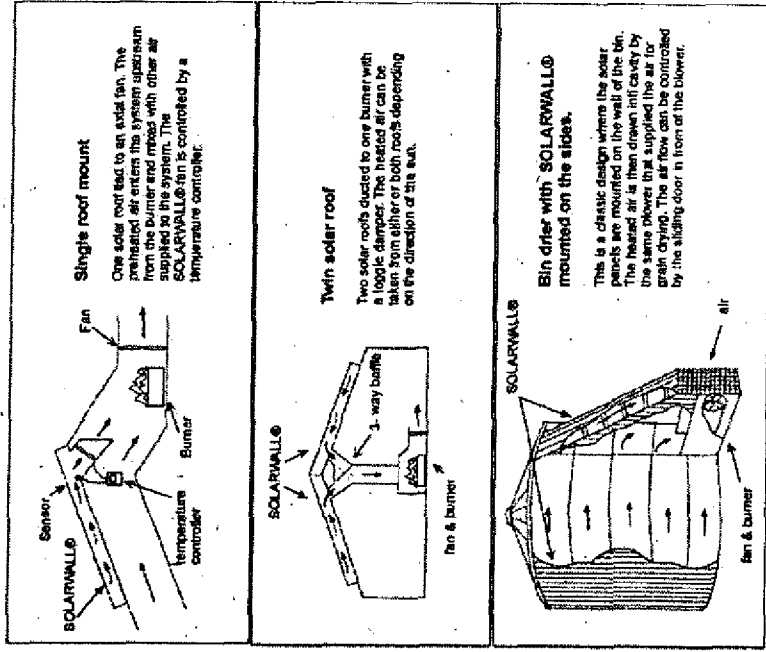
SOLARIWALL Drying system (GPEKS 2006)
